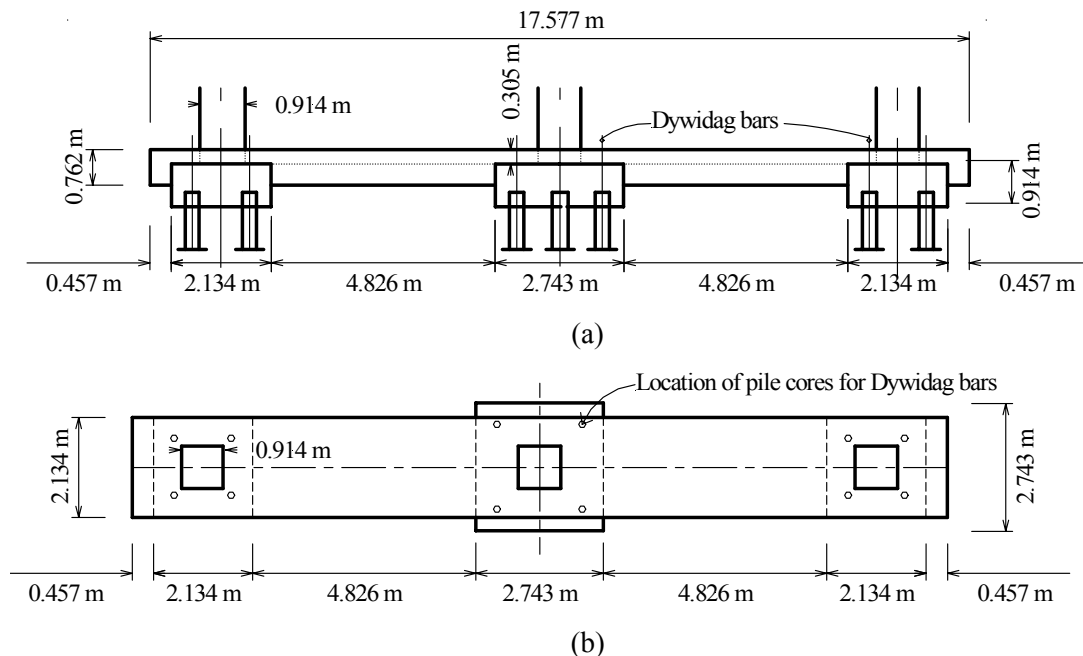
Grade beam retrofit: (a) elevation, and (b) plan
